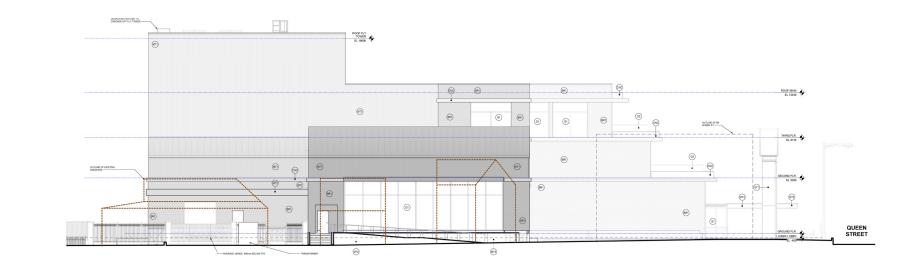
West Coloured Elevation Source: Lett Architects Inc.
